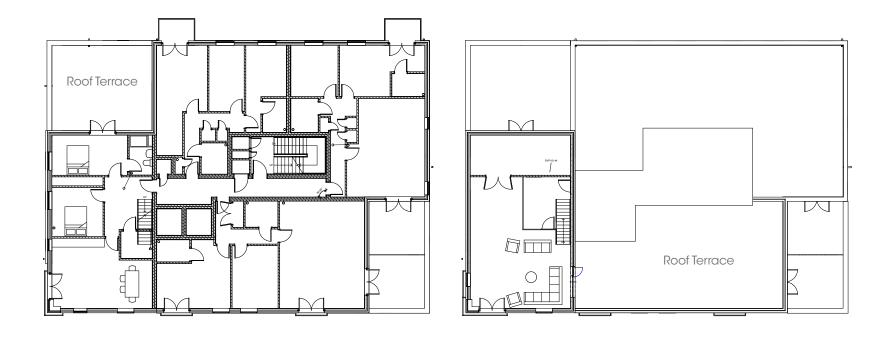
IW proposed Levels 6 and 7 apartment layouts
